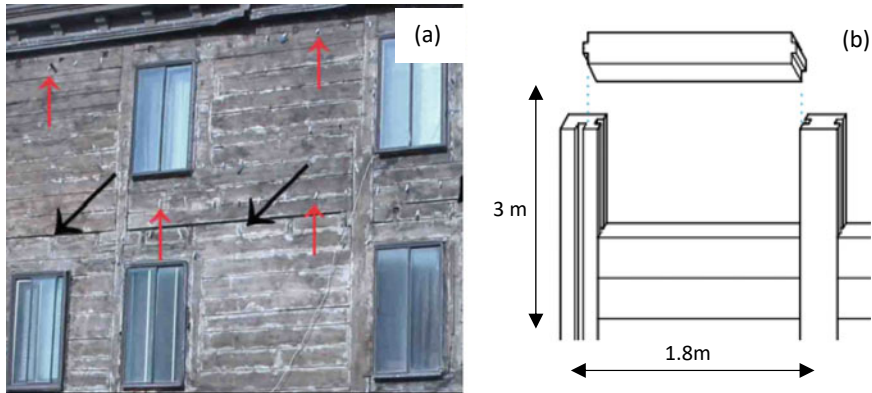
Typical timber plank wall: a facade wall and b typical tongue and groove joint [10, 18]
